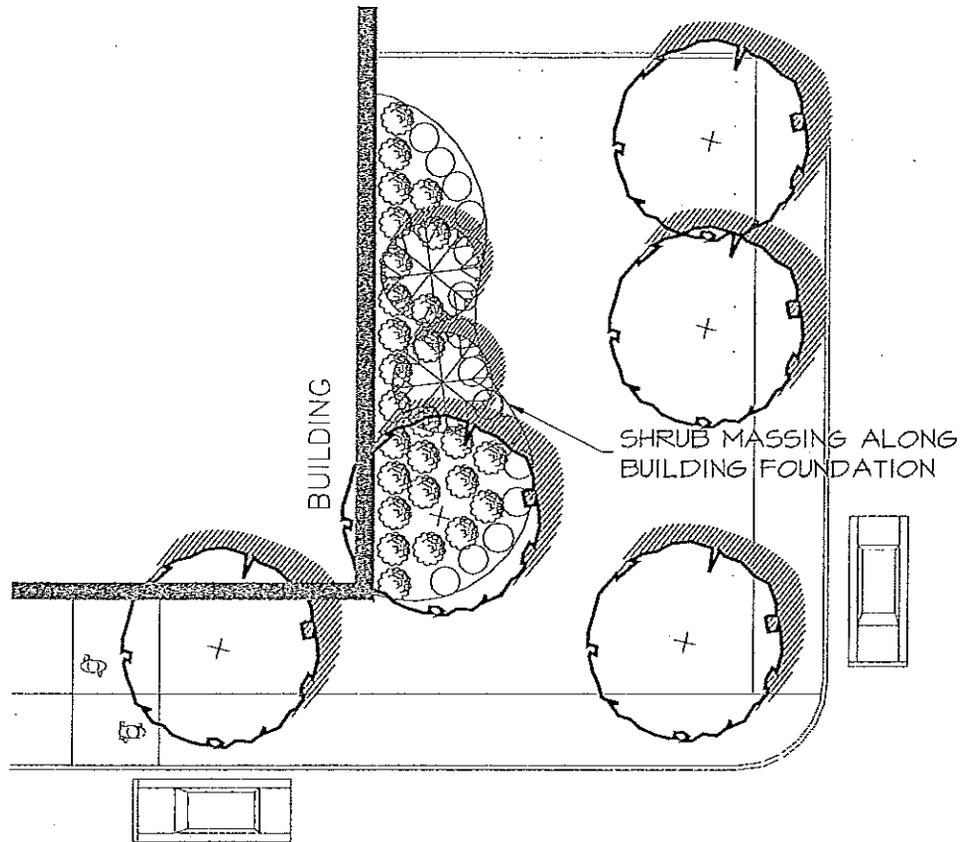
TYPICAL LANDSCAPING BED MASSING
